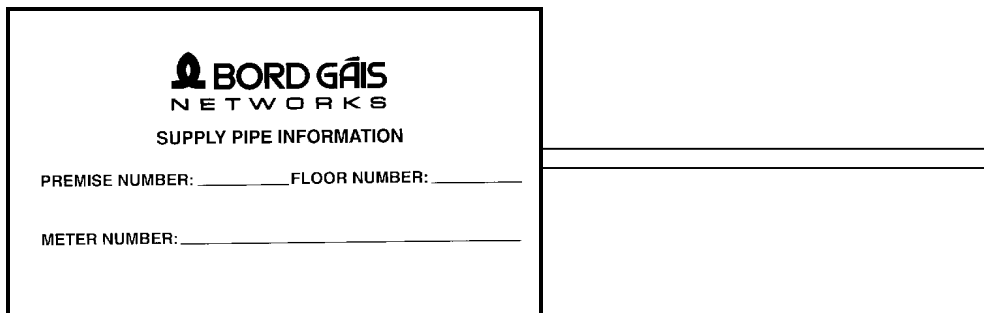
Tie-Wrap label details. Attach one to each supply pipe just outside the cabinet.
